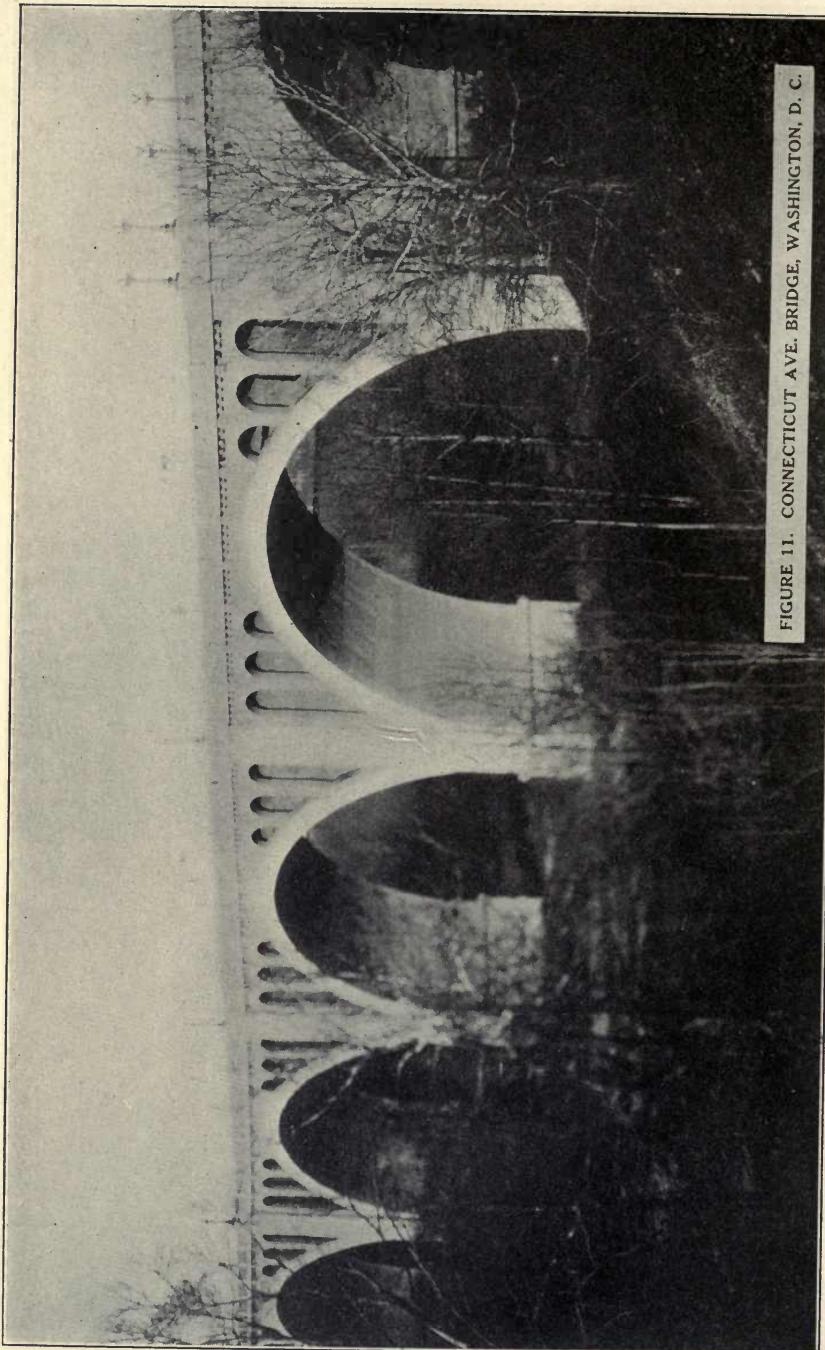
CONNECTICUT AVE. BRIDGE, WASHINGTON, D. C.
